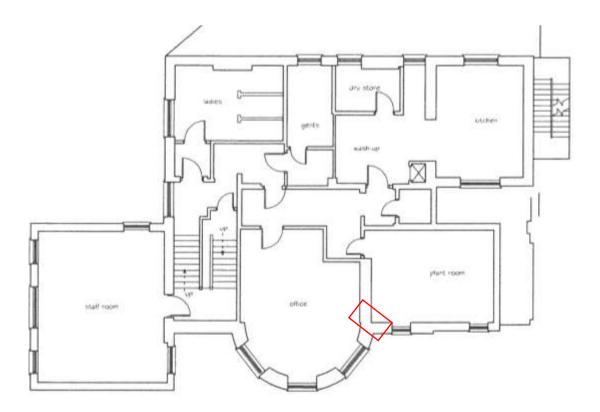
Plan of first floor showing position of fireplace that was recorded.
